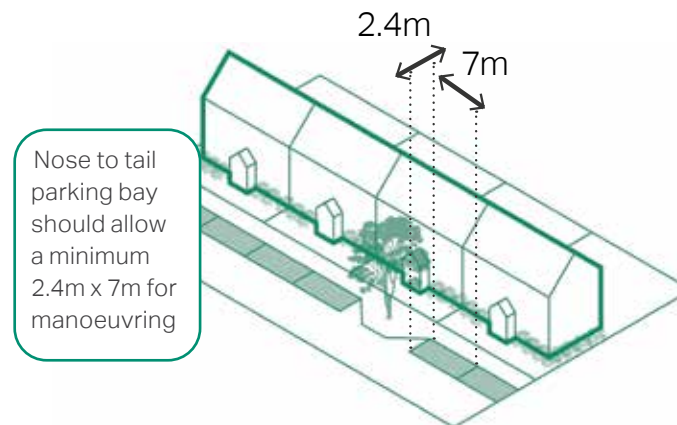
Illustrative diagram showing an indicative layout and minimum dimensions of on-street parking bay.
